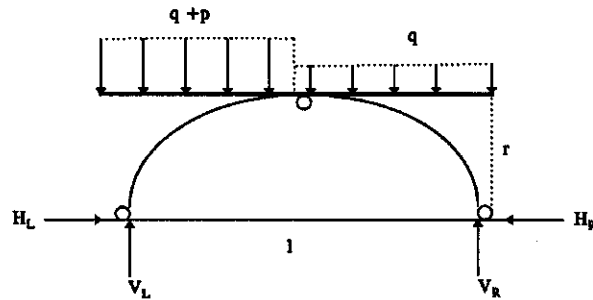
Three-hinged arch with vertical distributed dead load on entire span, plus half-span live load.
